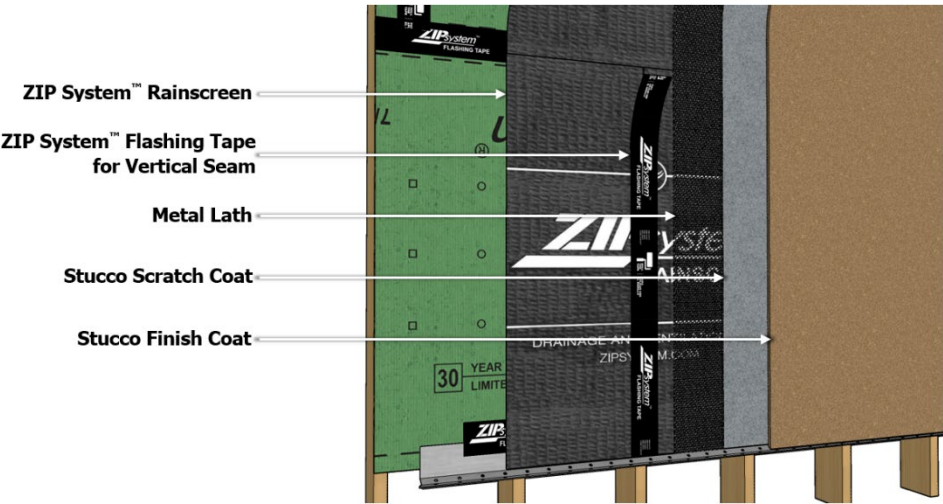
TYPICAL INSTALLATION WITH STUCCO
